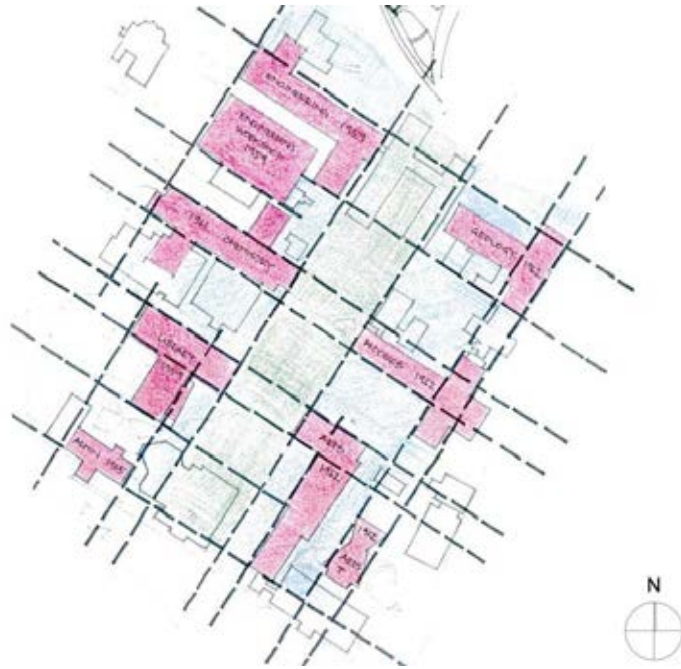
Central Campus plan marking the buildings from 1959 to 1965 showing the arrangement of buildings in the first period of development. The buildings, even though all the buildings are of different designs, they follow a fairly strict arrangement of both built form and open space as indicated by the grid lines. The central avenue is open along its length. Source: Paul Davies Pty Ltd
